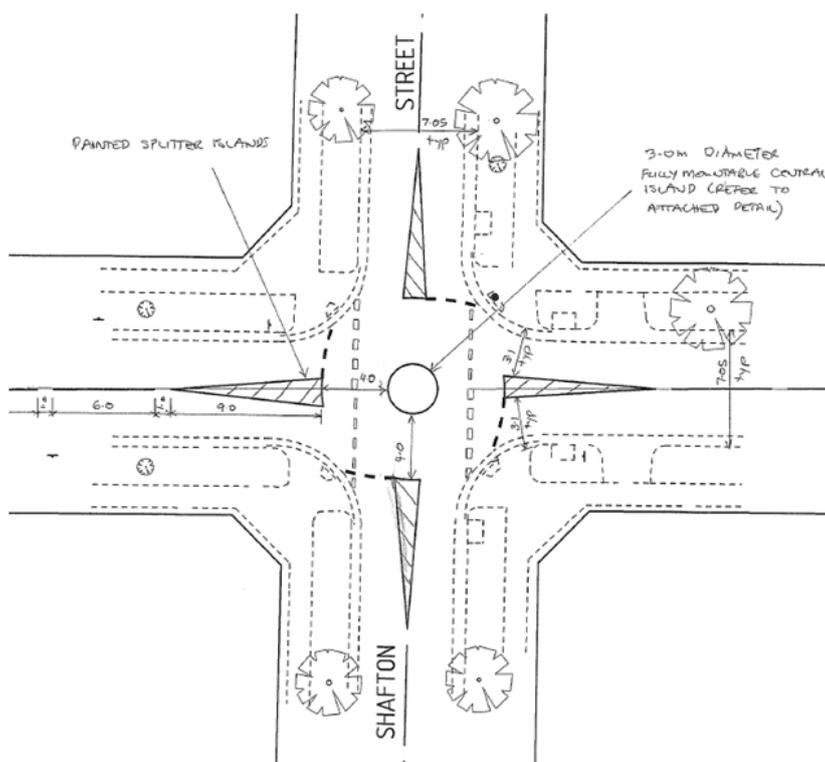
Plan drawing of mini-roundabout (Source: Tillotson 2015)
